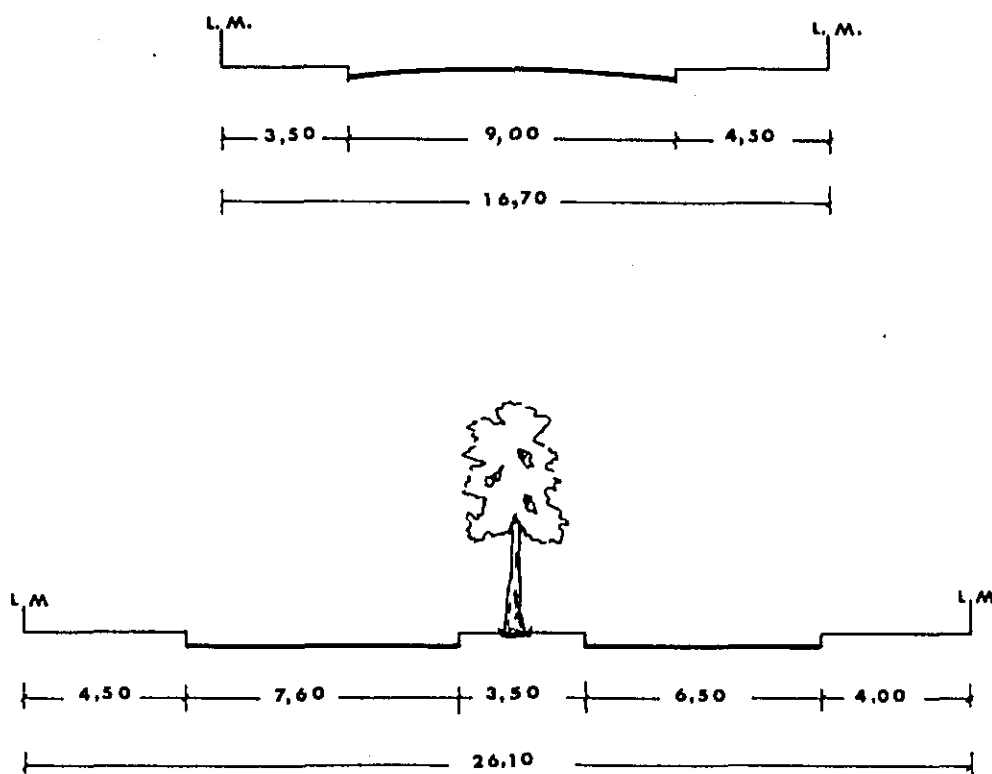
CROSS SECTIONS OF MAJOR ROADS (3)
